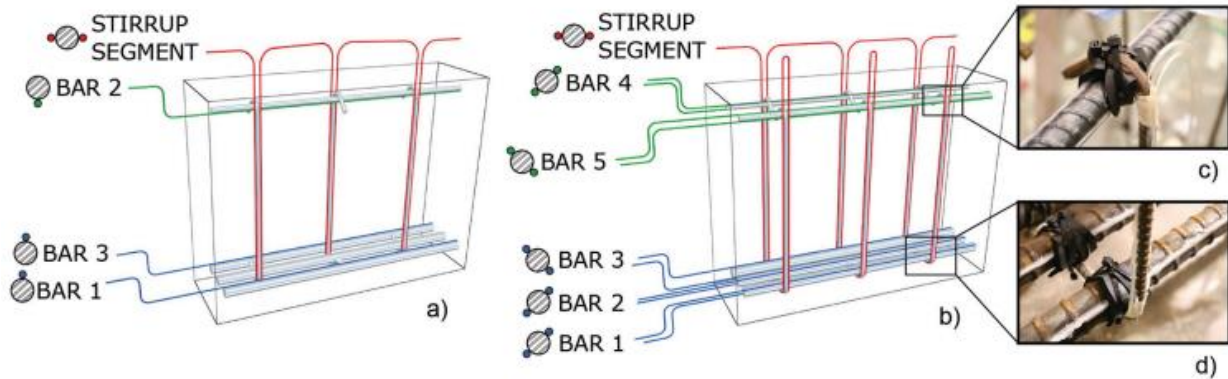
DFOS Layout on Reinforcement Cages (Poldon et al., 2021)
